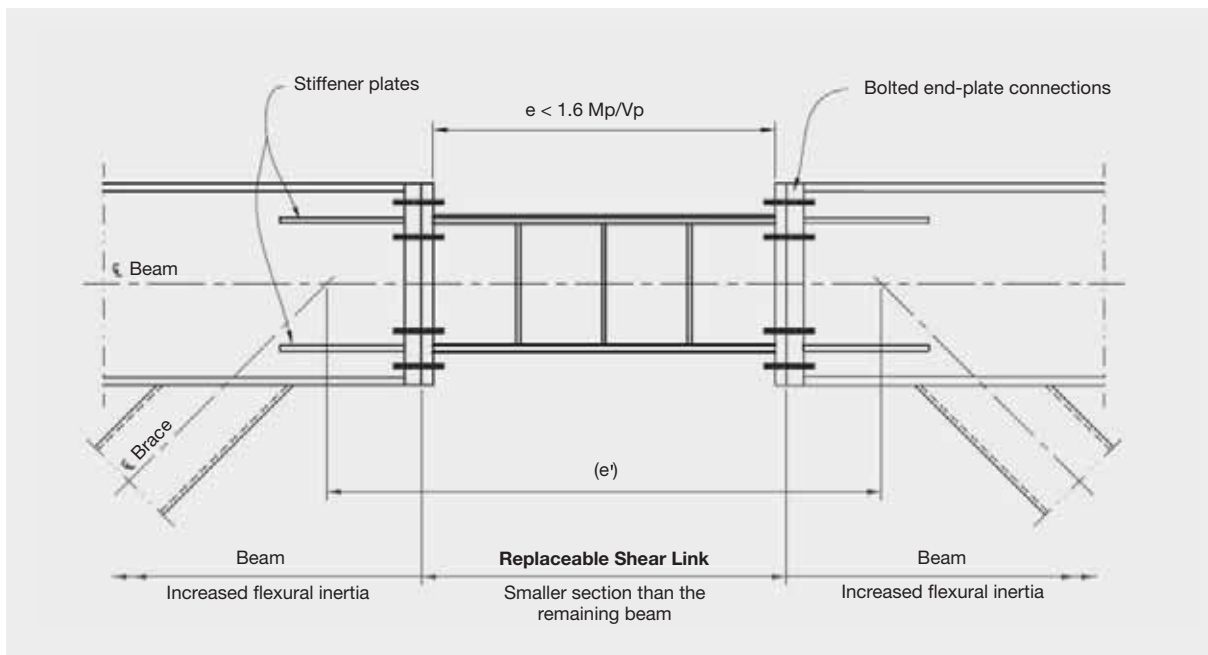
Bolted replaceable link in an eccentrically braced frame (EBF) (source: Buchanan report)
